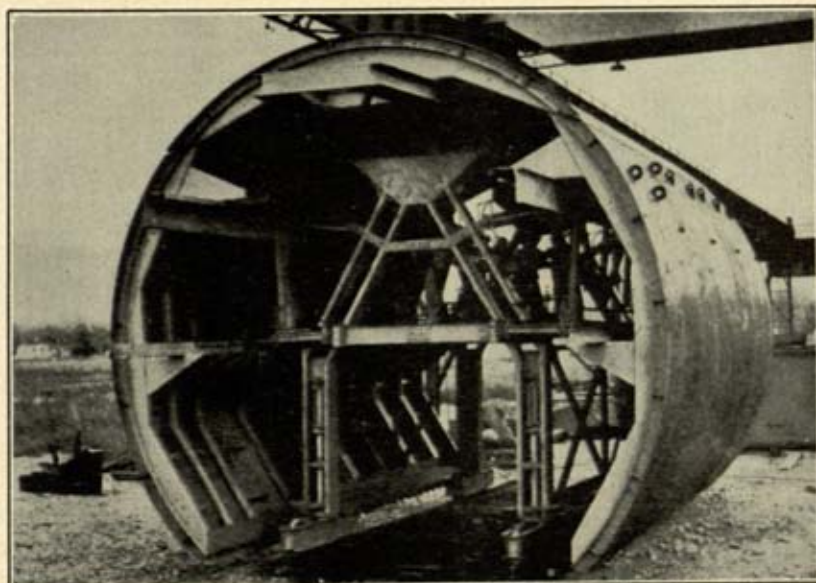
Steel forms used to line tunnels. (Chicago Bridge & Iron Co.)
